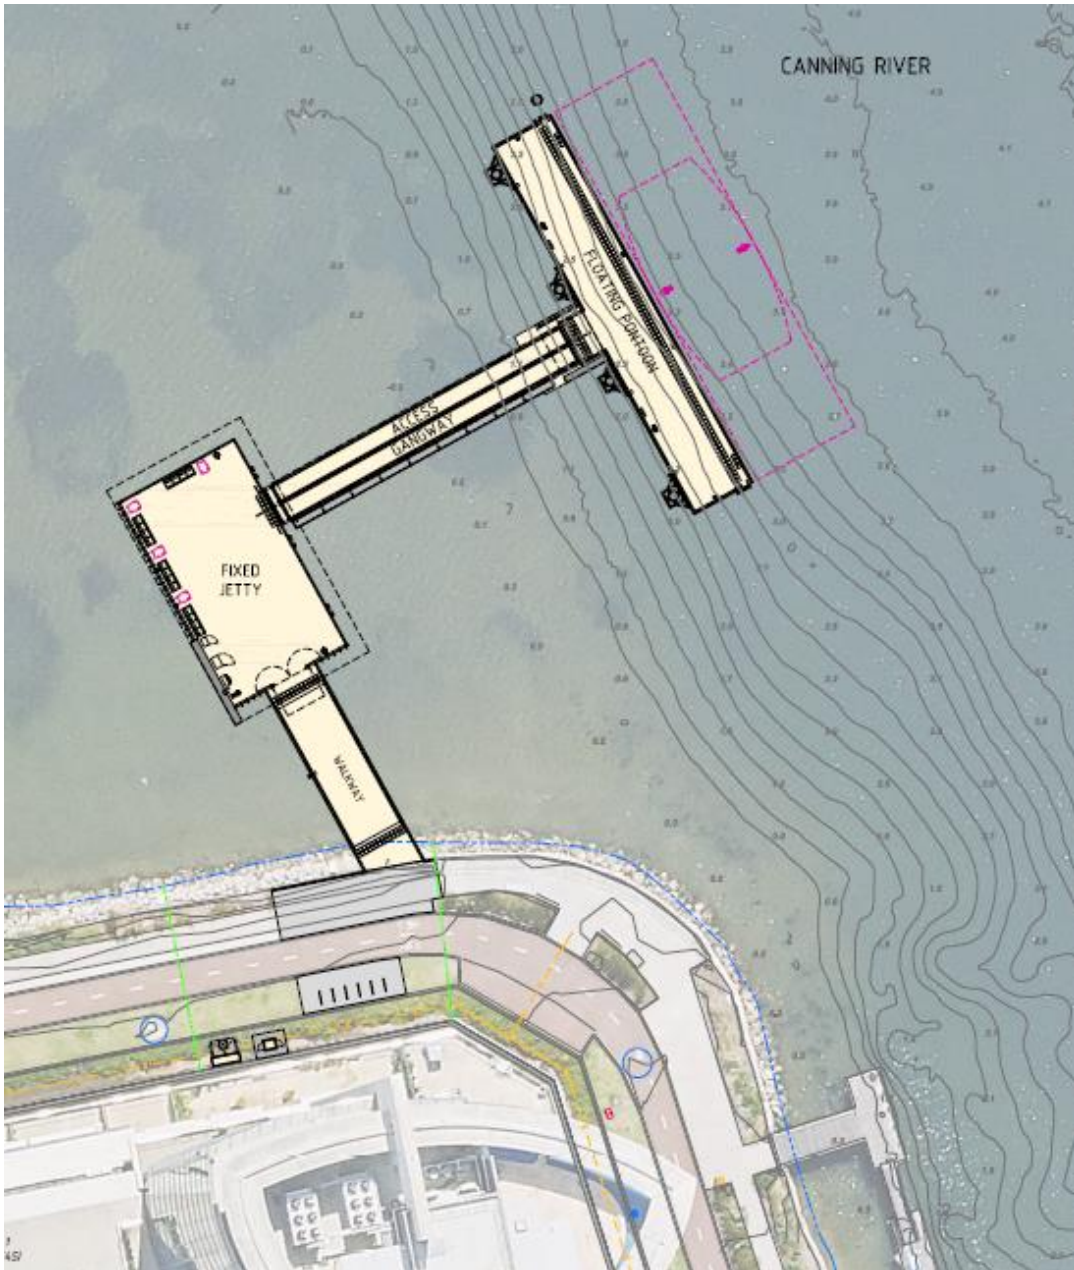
Layout of proposed Applecross ferry Terminal (Reference: Applecross Ferry Stop – Overall Site Plan, 24.602-SK03-A)
